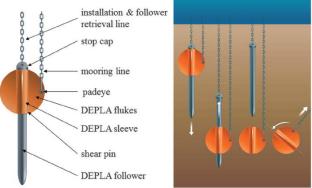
Plate Anchor (Wang and O'Loughlin, 2014)
